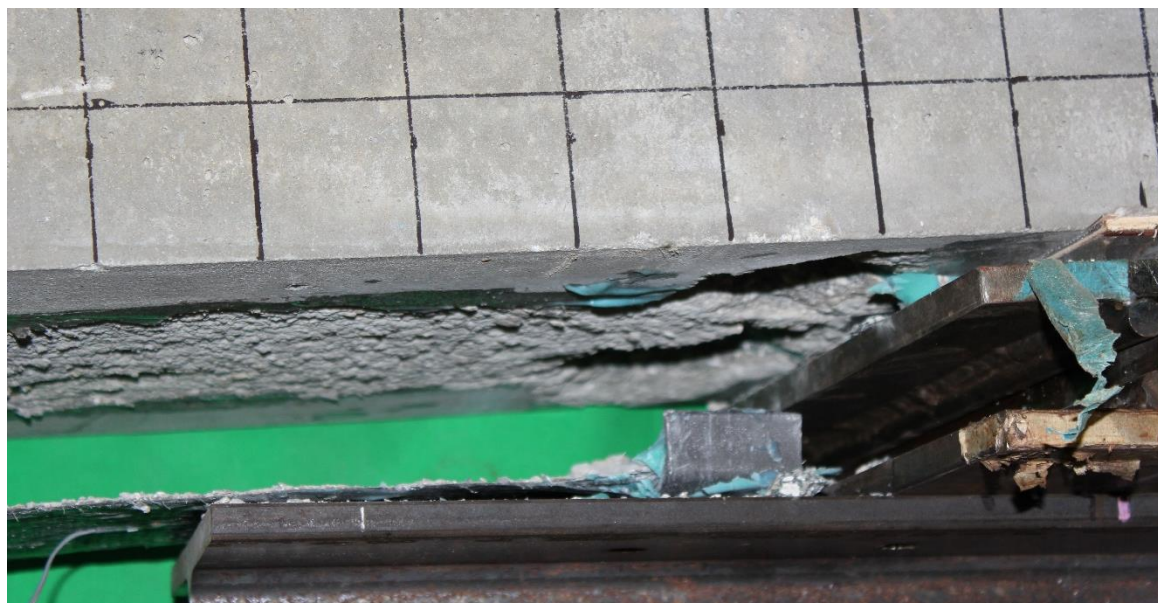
Slab 001 debonding and anchor's failure at the end of the test
